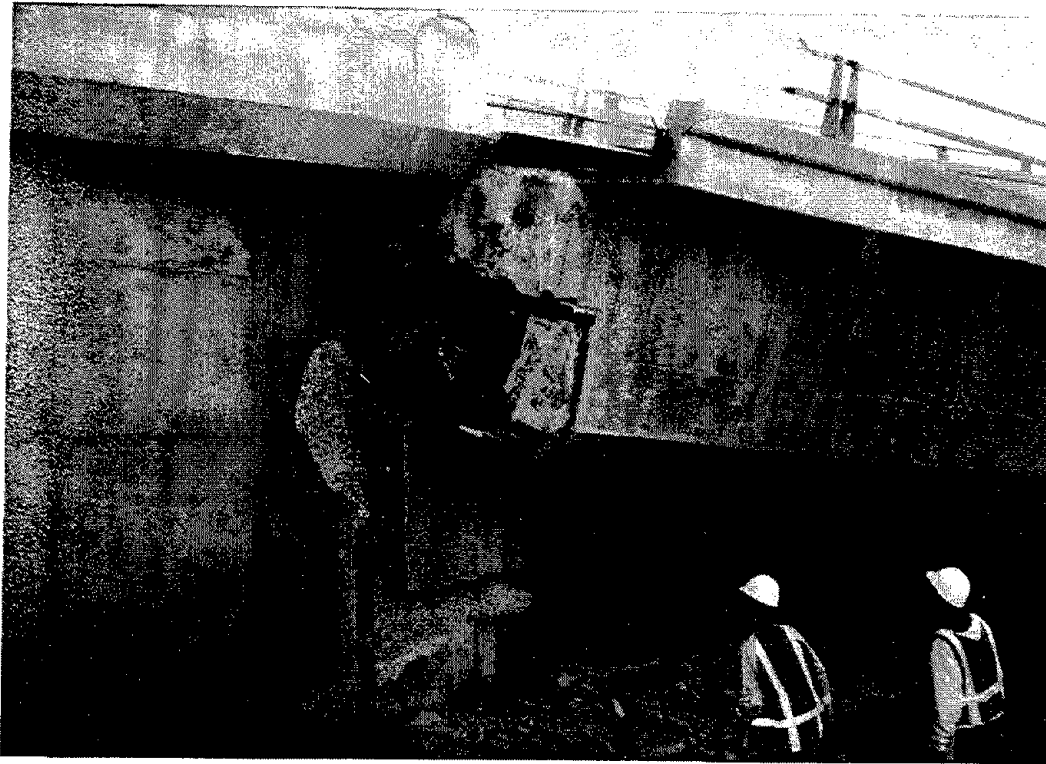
Earthquake Damage at Abutment #1 to the North Connector.
